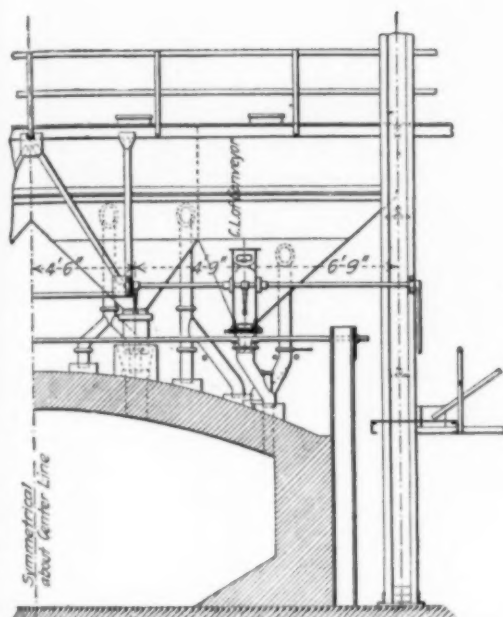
SECTION REVERBERATORY FURNACE SHOWING CHARGING ARRANGEMENT
